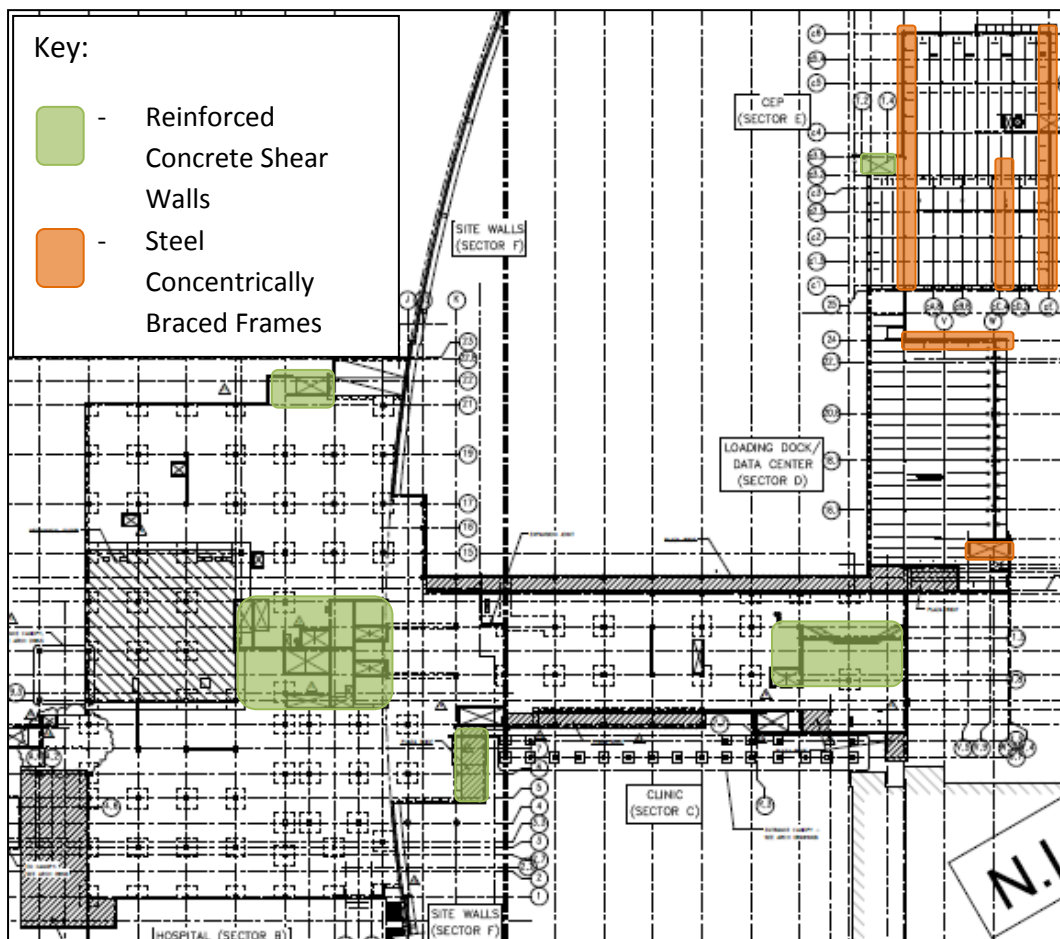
Level 1 Structural Floor Plan Highlighting the Lateral System. Courtesy SGH.
